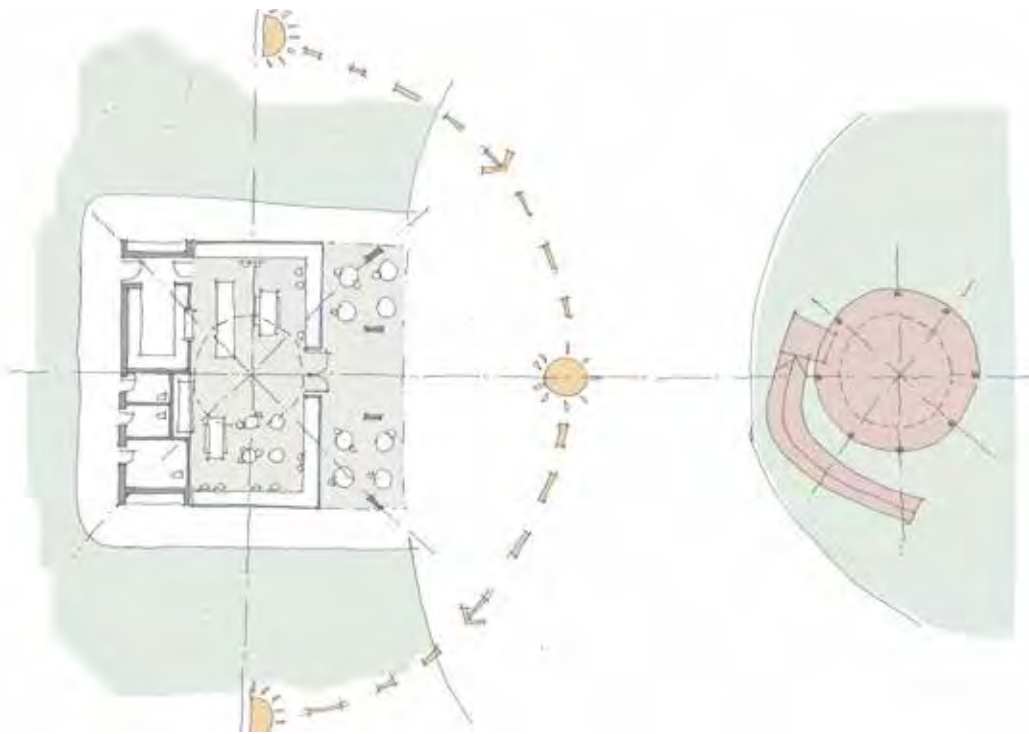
Sketch plan of proposed new tea rooms and bandstand.
